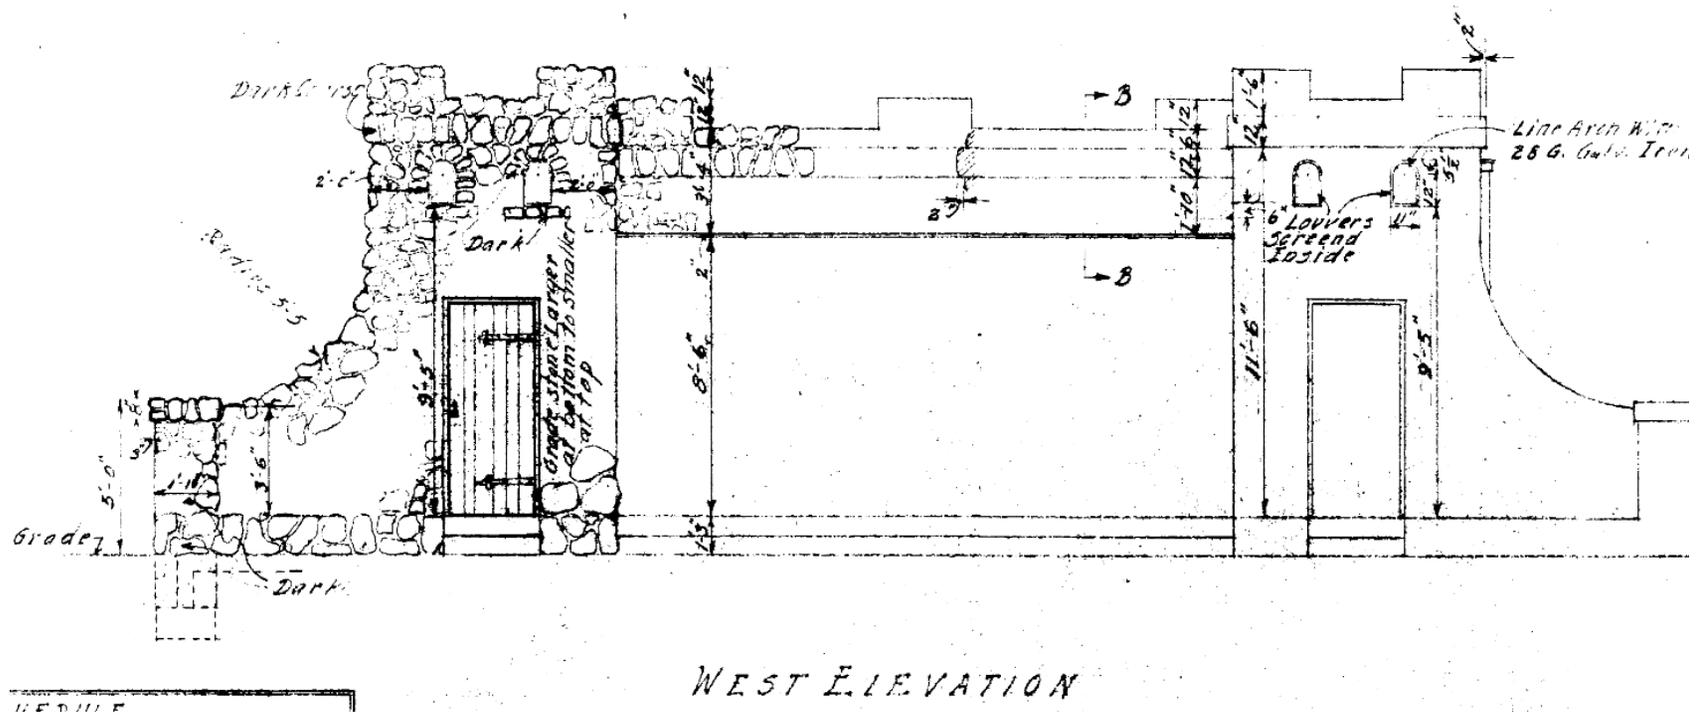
Plan drawings for Palm Park shelter, detail of west elevation, c.1930.²⁹
